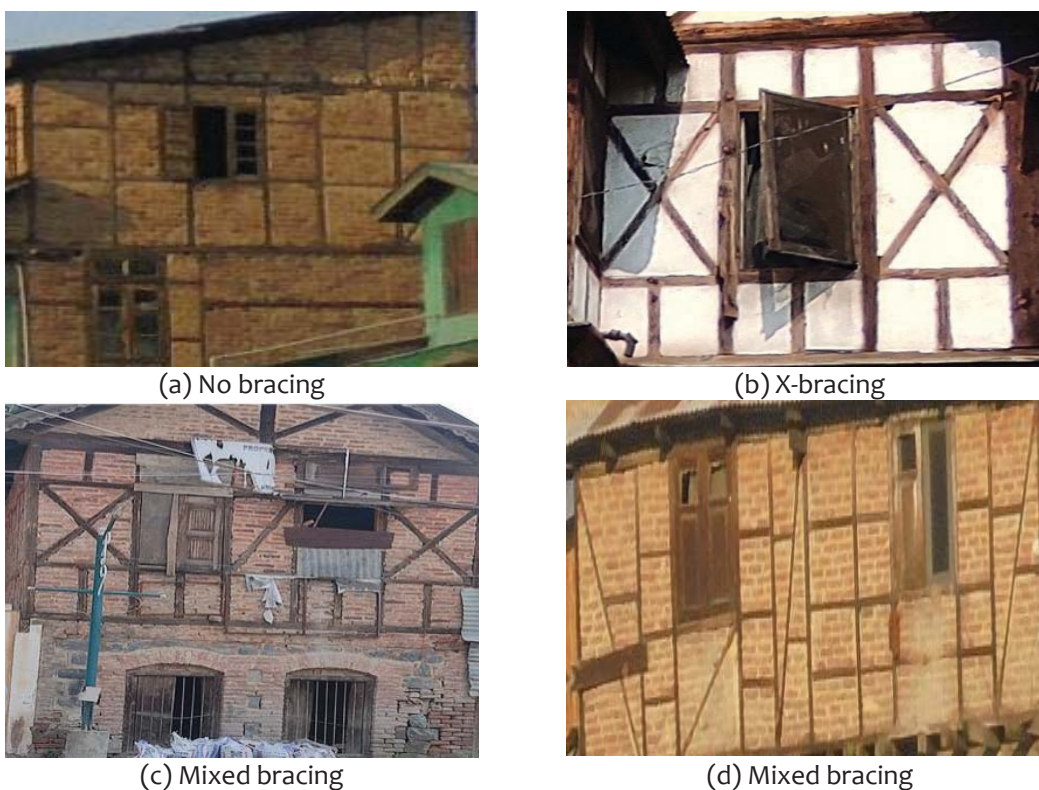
Bracing patterns in Dhajji-Dewari buildings
